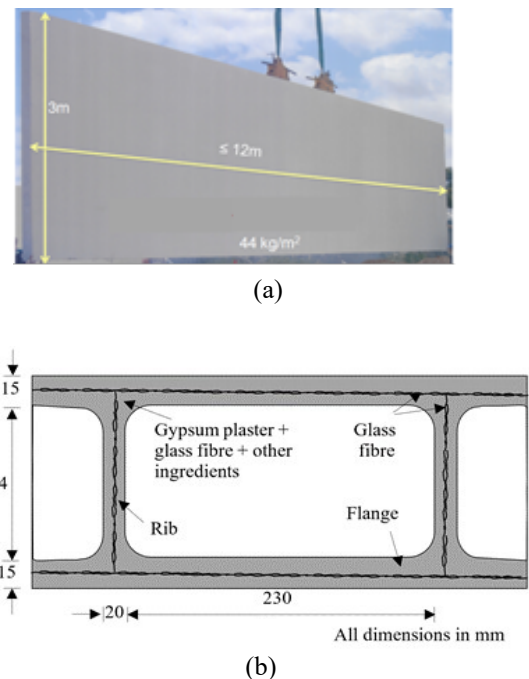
GFRG panel: (a) Elevation, (b) Cross-section
